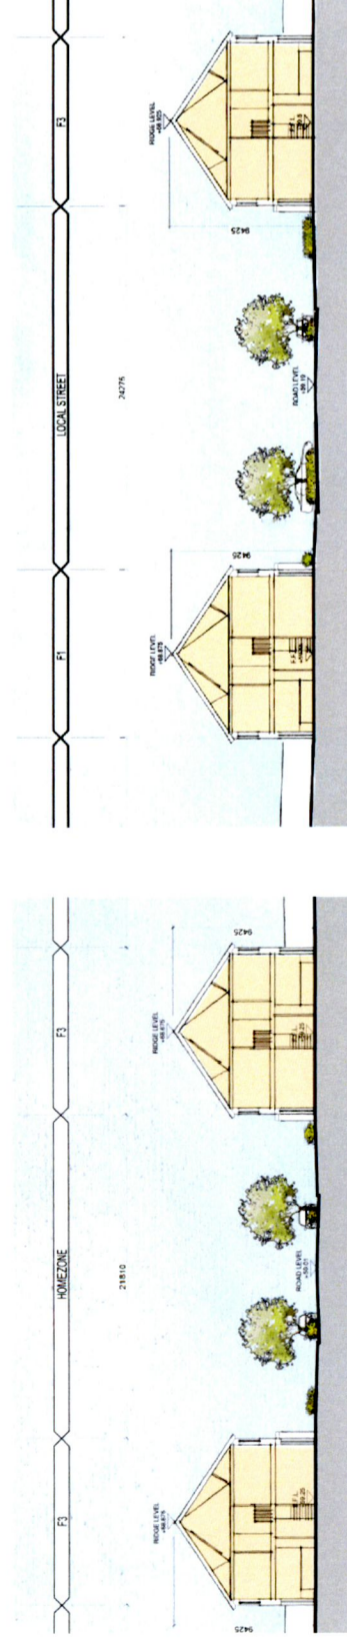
INDICATIVE "HOMEZONE" STREET SECTION
